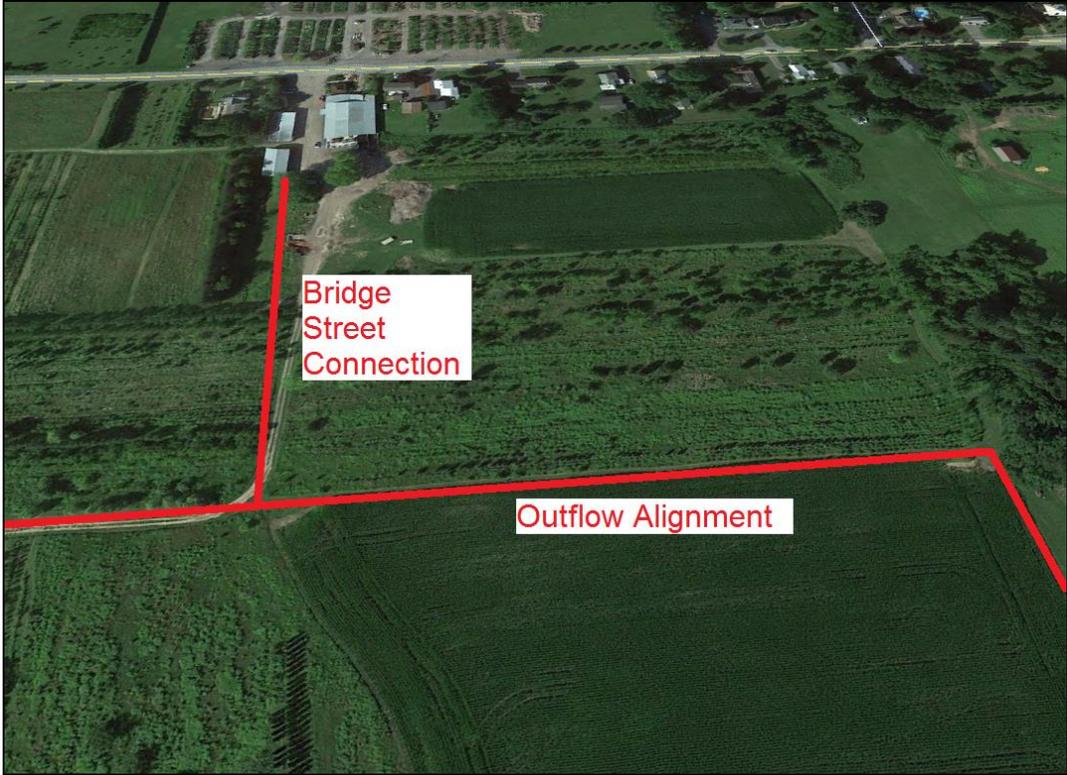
PROPOSED SITE PLANS ALONG WITH PHOTOGRAPH LOCATIONS.
